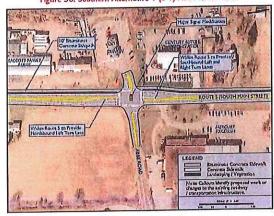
Southern Alternative 1 (5-1) Scantic Road Inset
